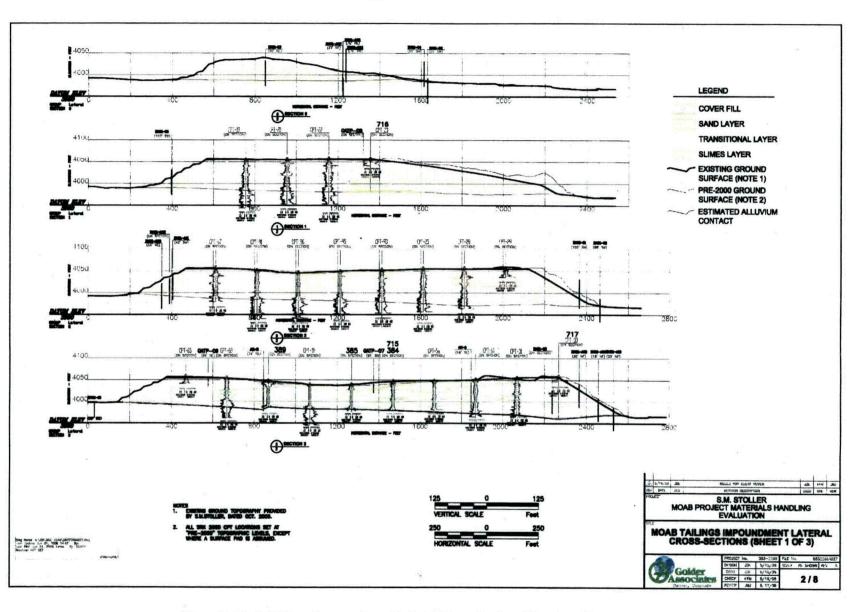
Moab Tailings Impoundment Lateral Cross-Section (Sheet 1 of 3)
